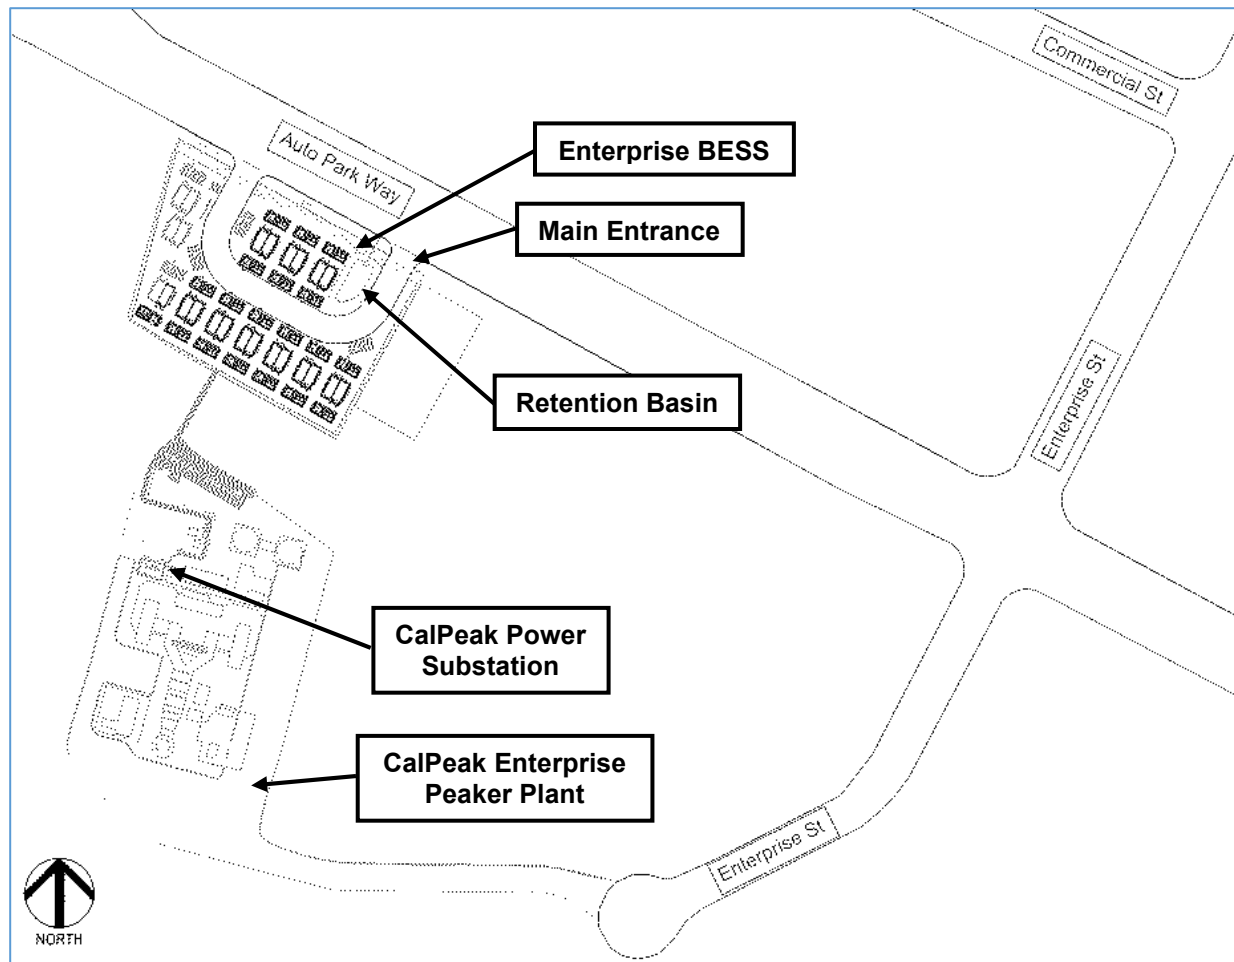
Enterprise BESS Site Layout. (North ↑)
